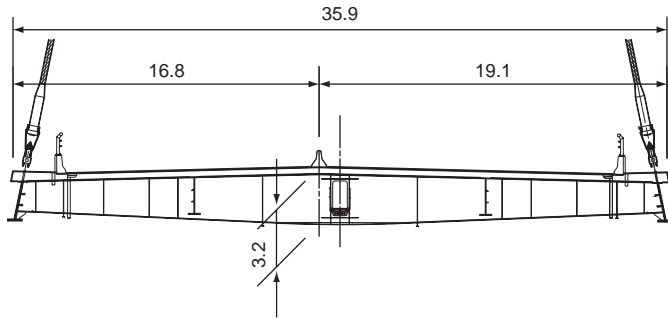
Twin girder composite deck – Industrial Ring Road Bridges, Bangkok (all dimensions in metres)
